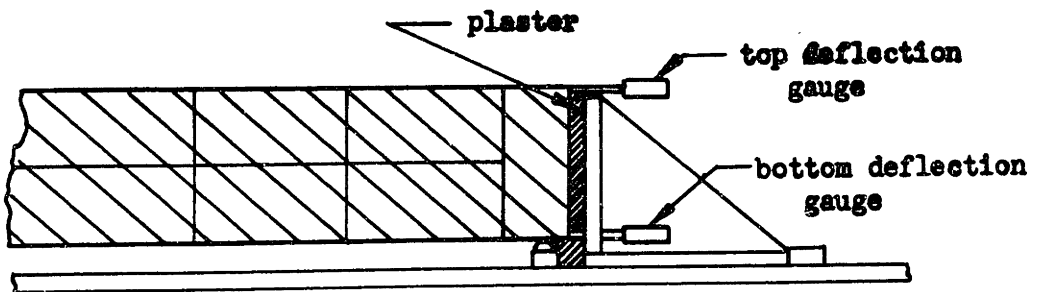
Scheme Used to Obtain End Rotation Values of Fixed End Beam Under Transverse Static Loading
